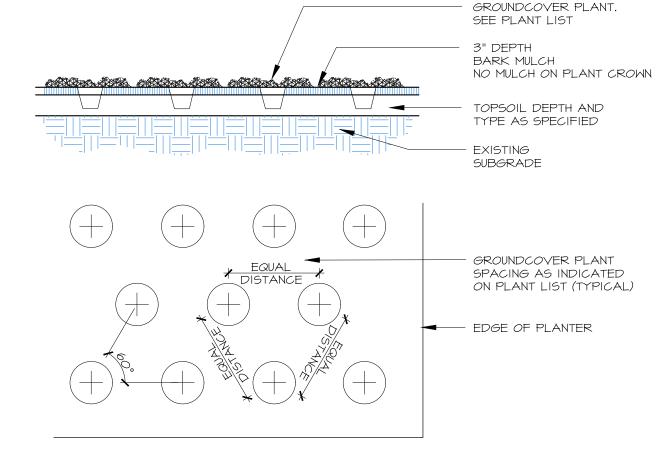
PLANTING DETAILS KEPRON PROPERTY 17232 SE 43RD STREET BELLEVIE MASHINGTON
